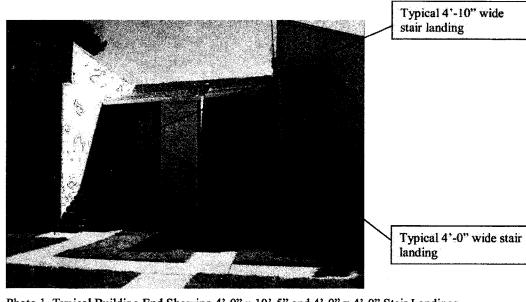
Typical Building End Showing 4'-0" x 10'-5" and 4'-0" x 4'-0" Stair Landings.
